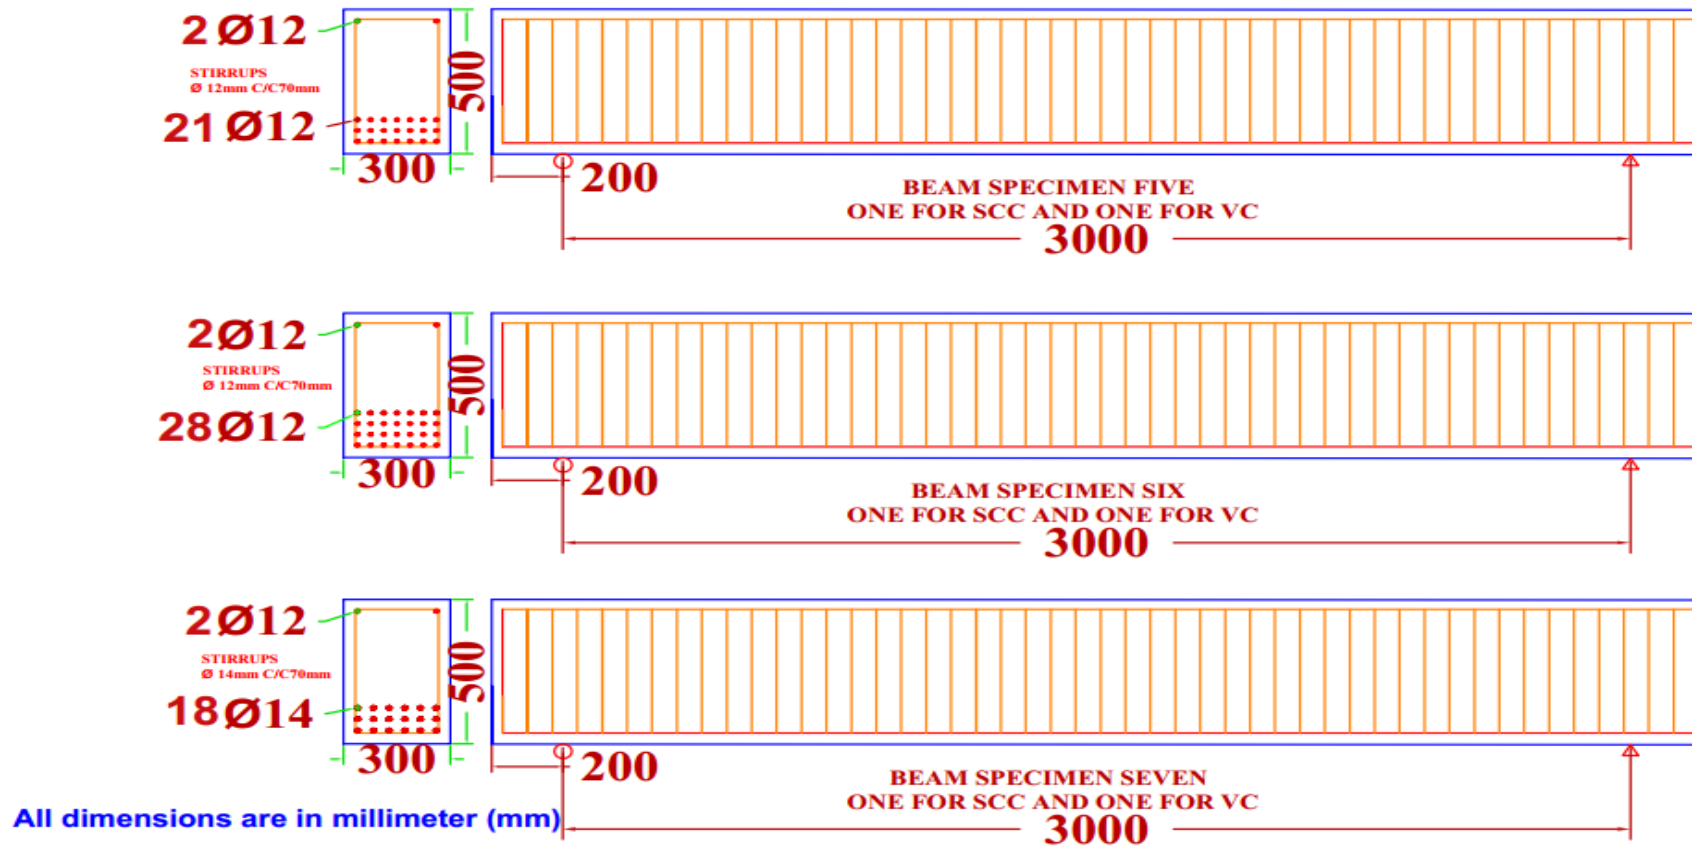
Specimen five, six, and seven cross-sectional dimensions, length, number and diameter of longitudinal bars, stirrup spacing and diameter.
